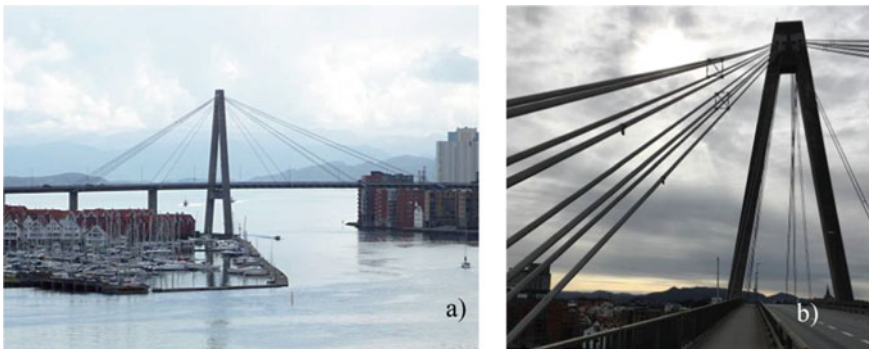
The Stavanger City Bridge. a A side view from west. b A view towards south, showing the cable setup, the accelerometers on one side and the anemometer pole
